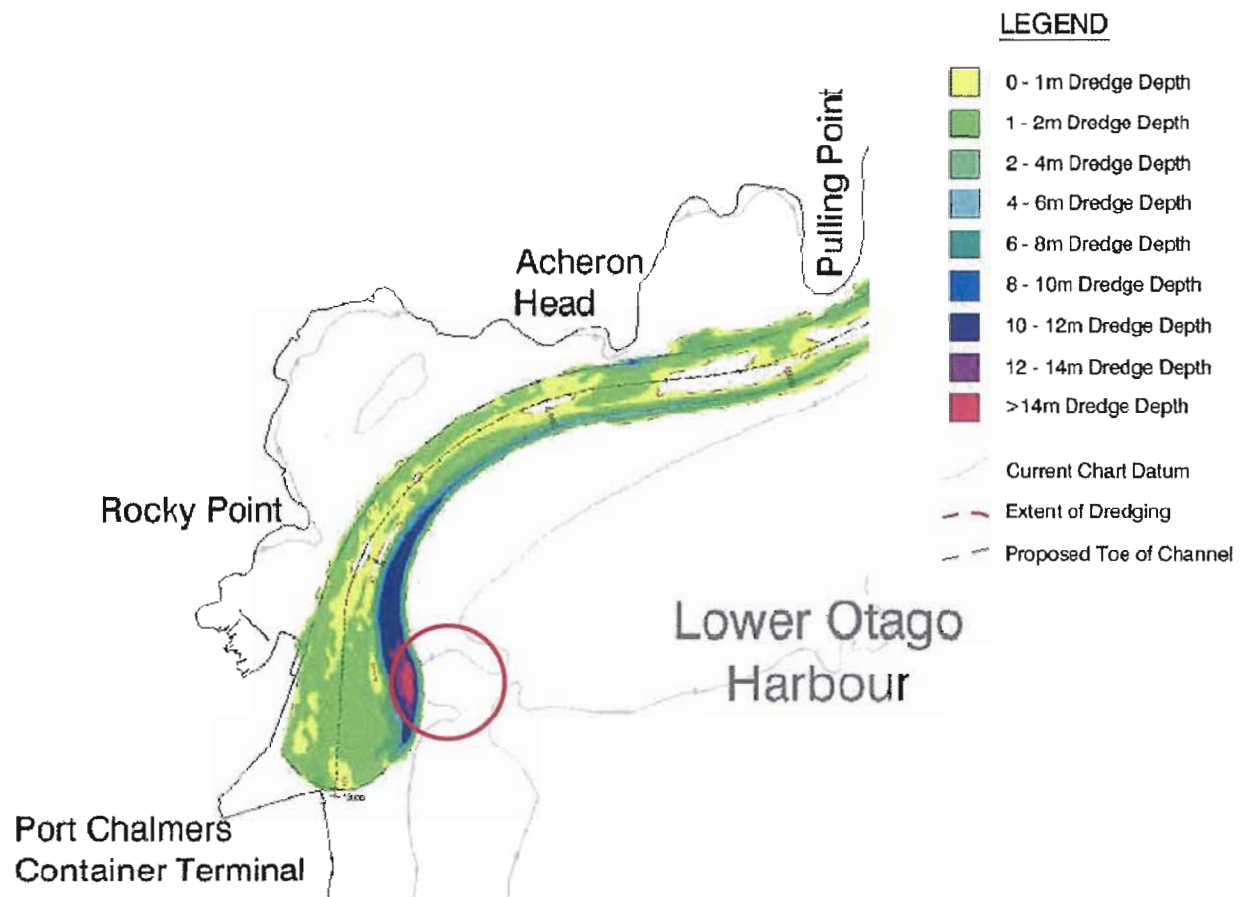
Area opposite swinging basin to be dredged under the current proposal (Adapted from Pullar and Hughes 2009).
